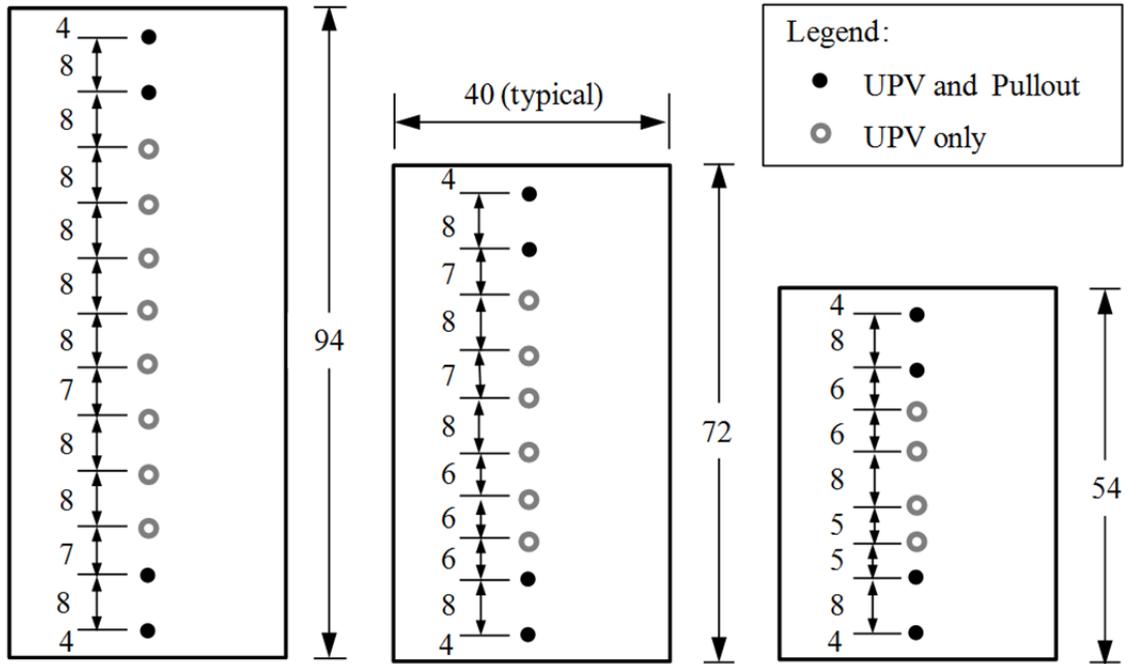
Location of UPV measurement and pullout testing locations on SCC-1 and SCC-2 walls (Note: All measurements in inches)
